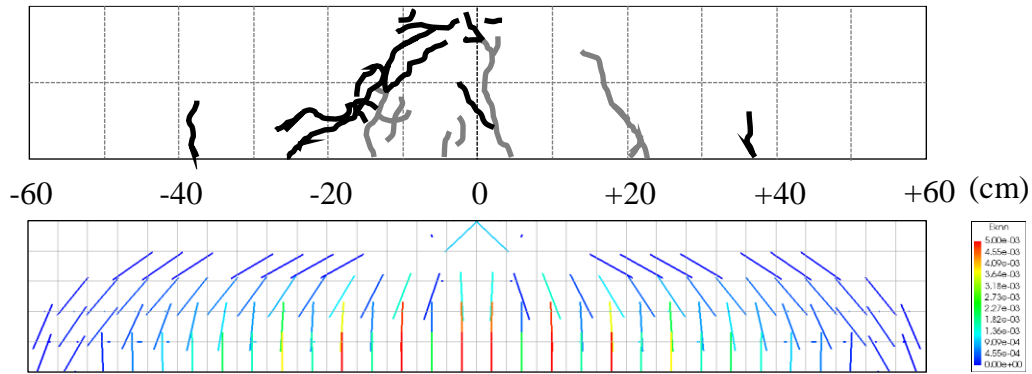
Cracking patterns at yielding/maximum load of beam “T” by FEM
